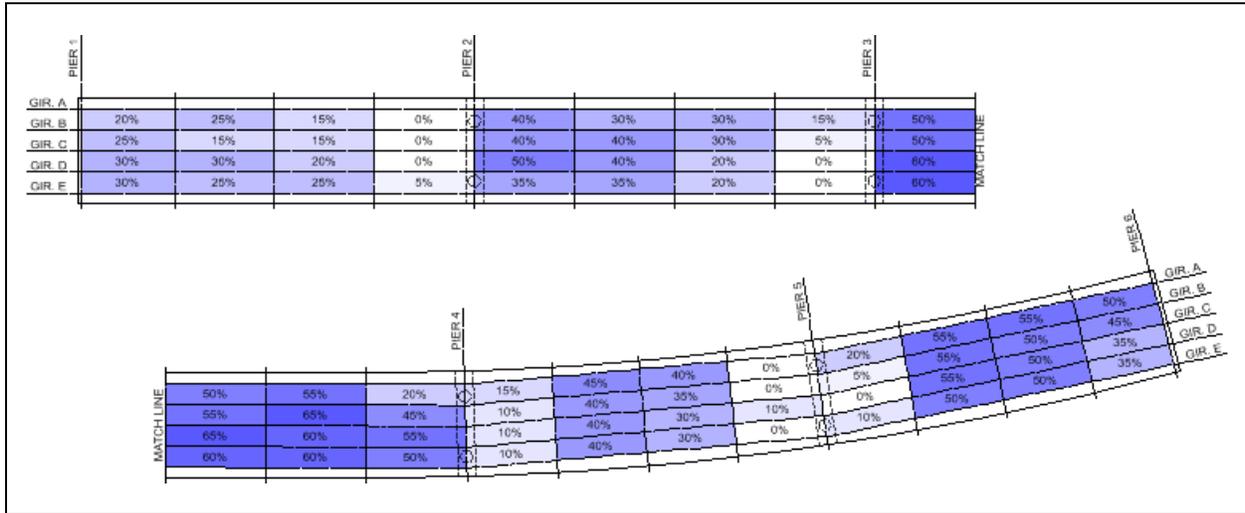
Bridge 6/115 Crack Intensity Diagram
